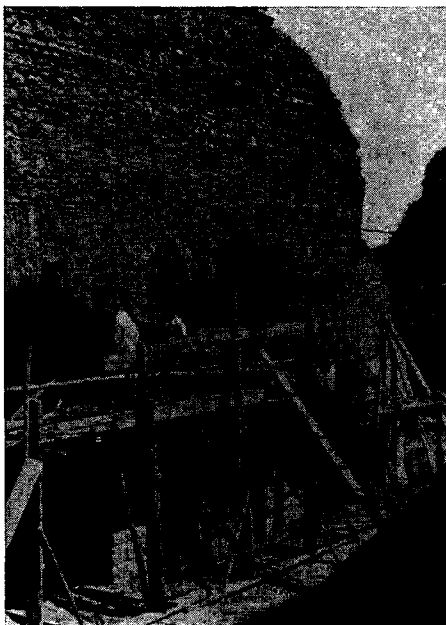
Gymnasium. Repair of west wall arches; Hall BE-H with swimming pool.
